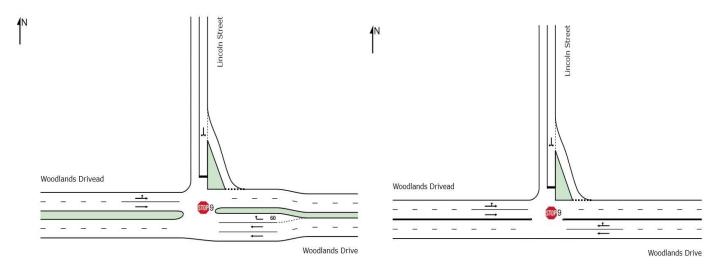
Woodlands Drive and Lincoln Street – Intersection 9 layout - Before Construction and During Construction
